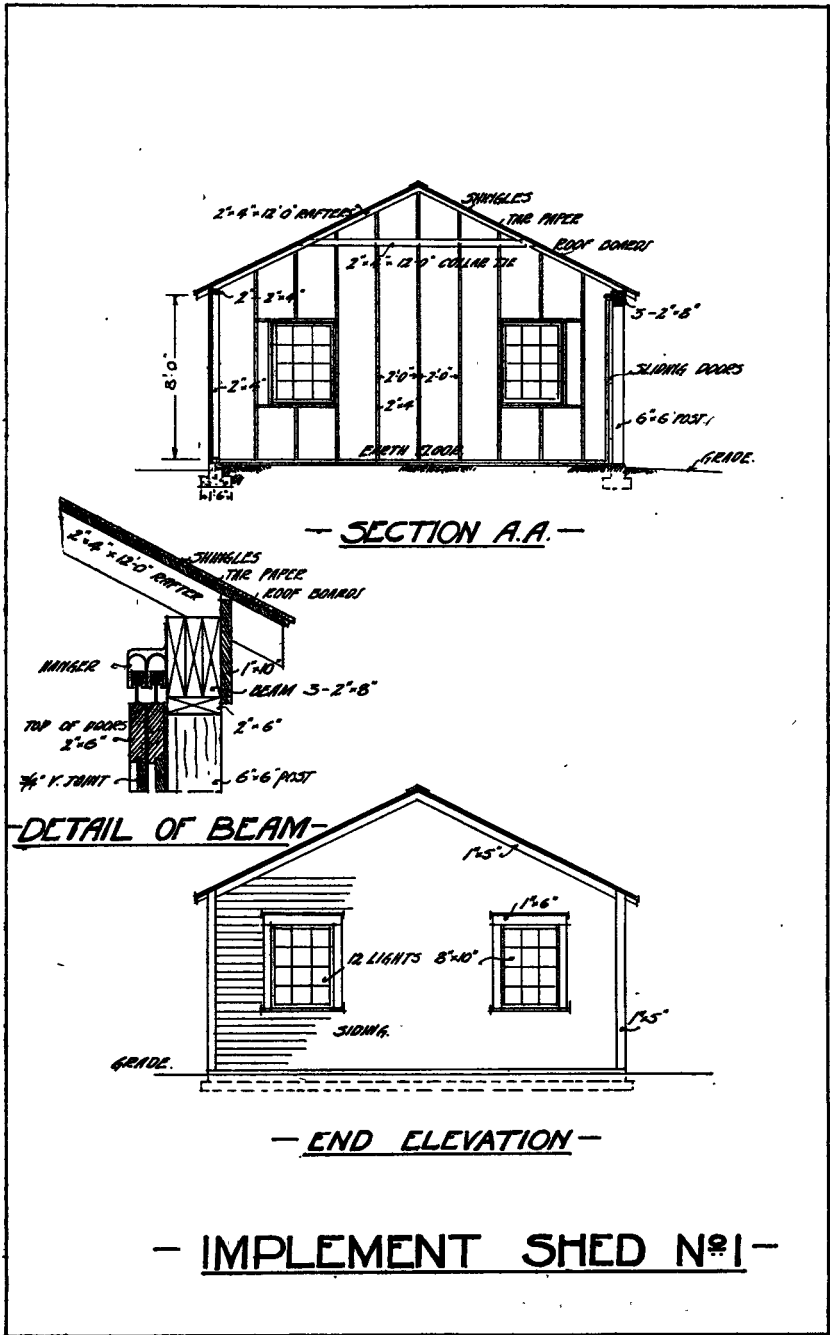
Showing the simple frame construction and the manner of building the beam above the sliding doors.
